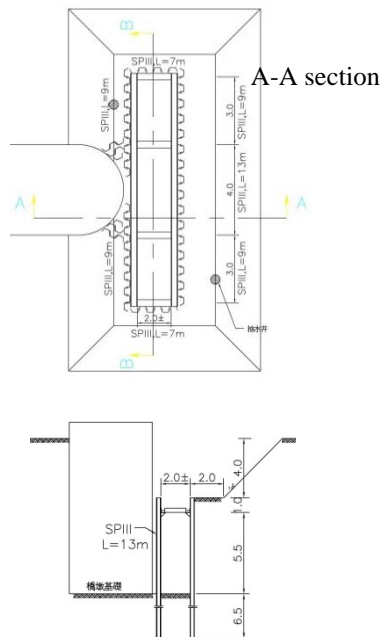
Design drawing of temporal retaining wall for proof excavation
